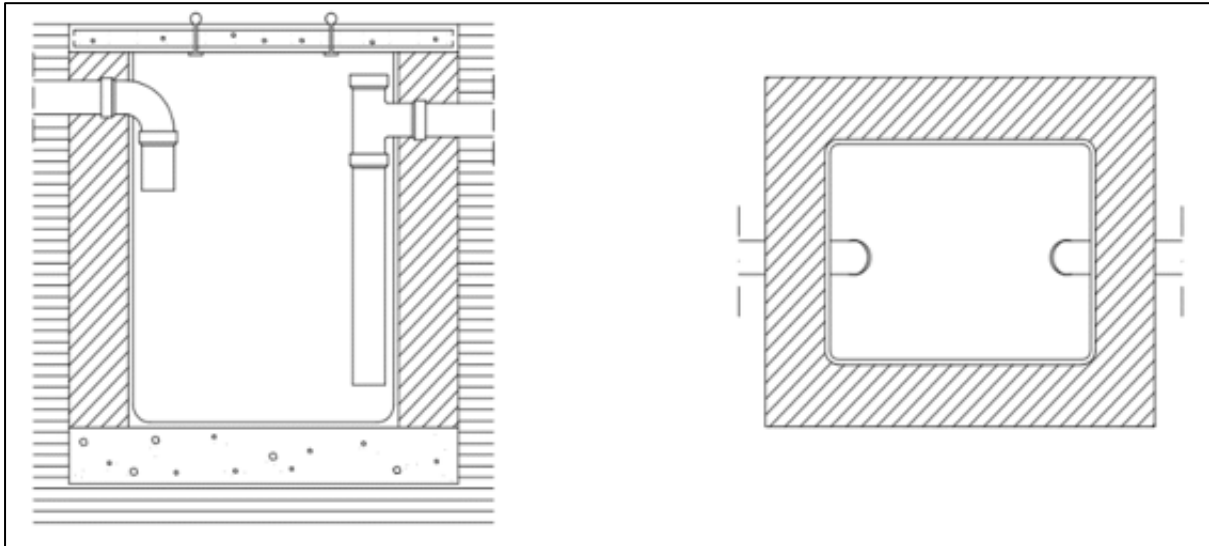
Typical lay-out of a concrete grease separation chamber
